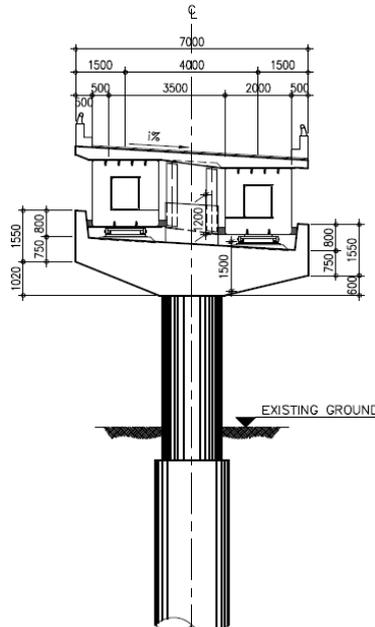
(12/12) CROSS SECTION
